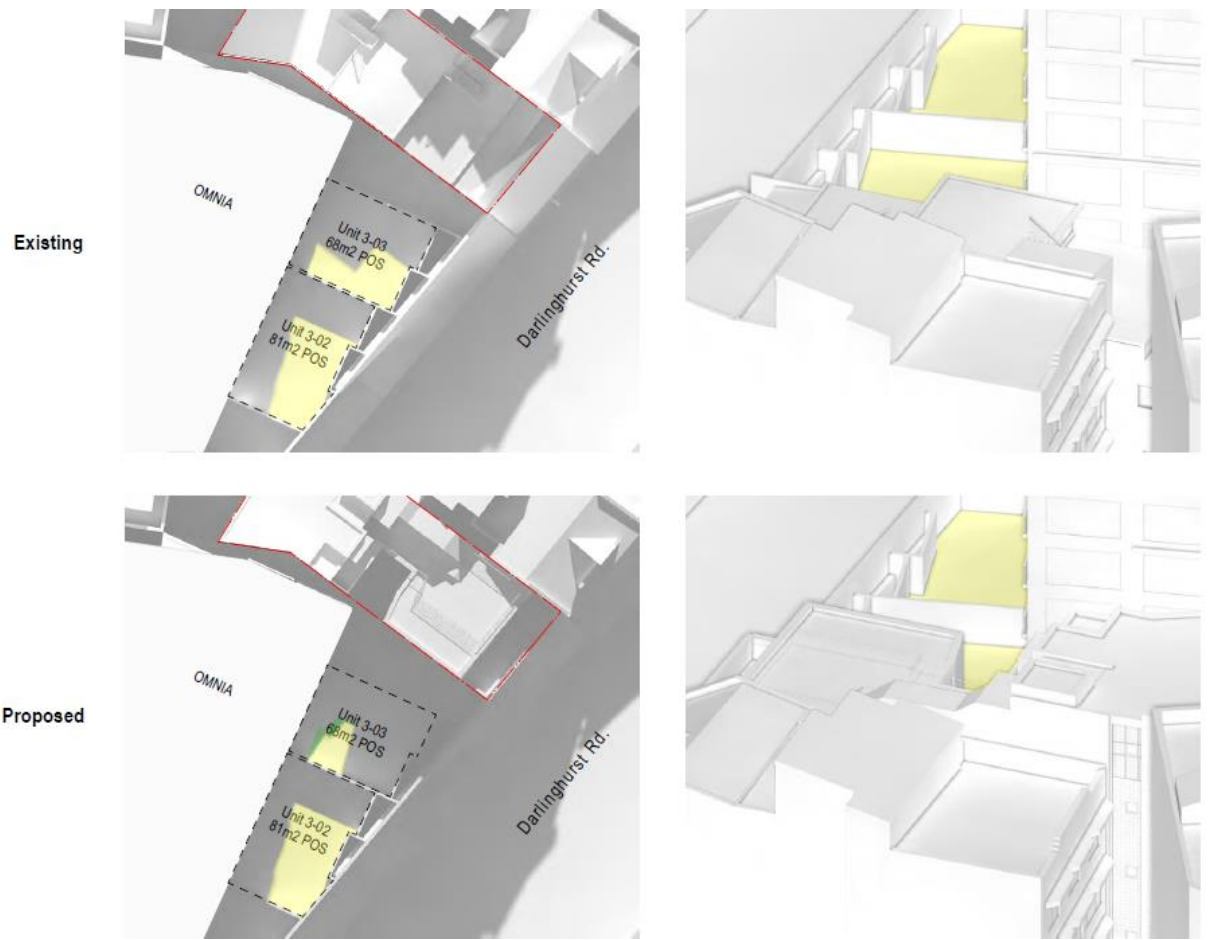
Plan and view from sun diagrams for private open space of Omnia building residential apartments at 11am, 21 June
